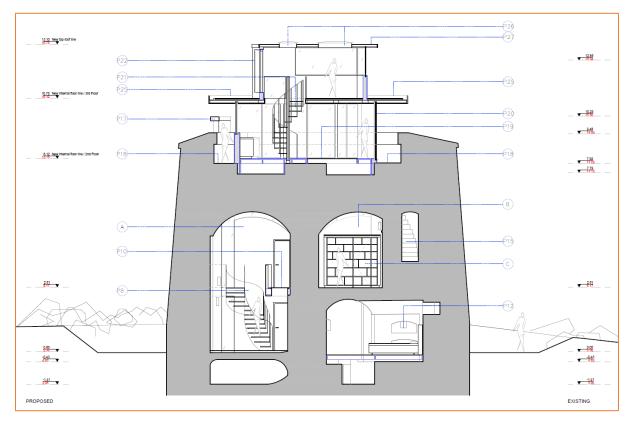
Proposed section showing finished floor levels (Source: Koldo and Co)
